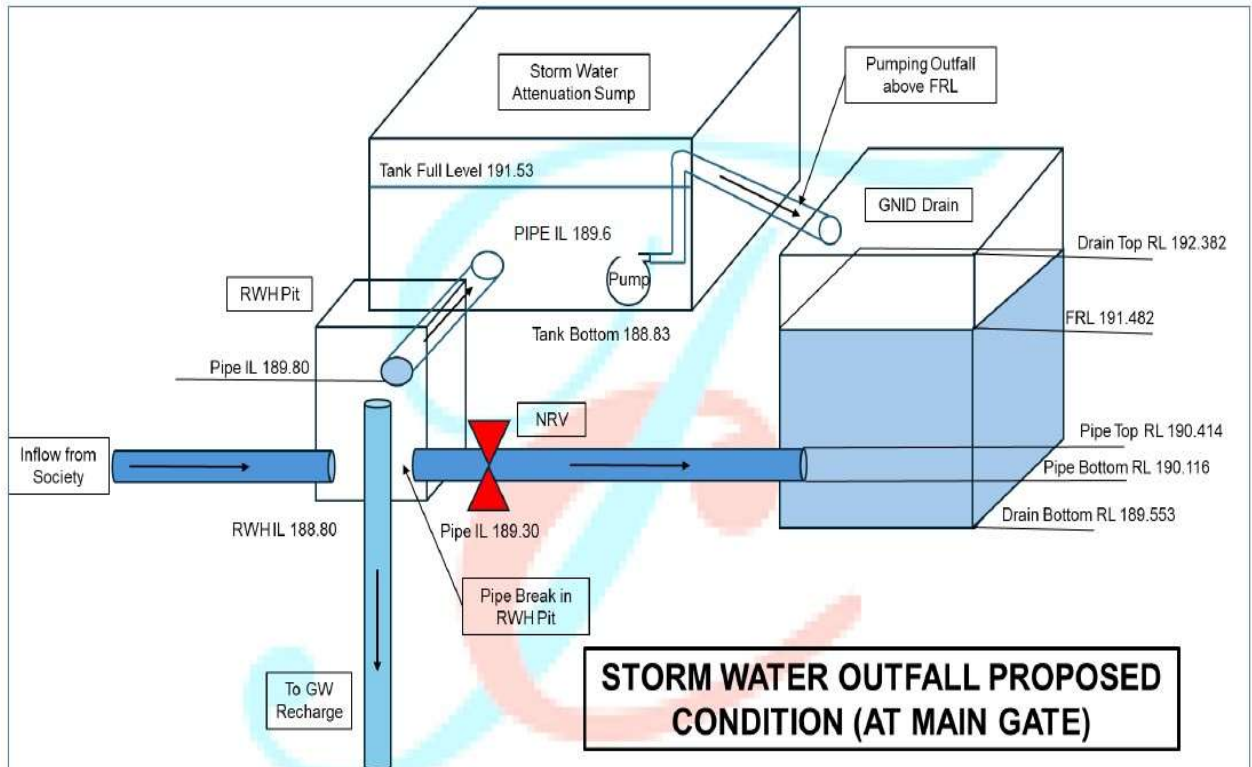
Stormwater Outfall Proposal with Attenuation Tank and Pumping
